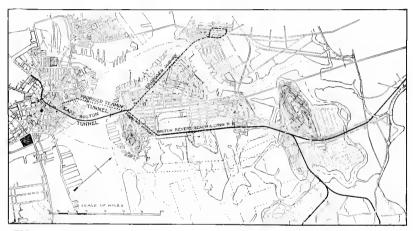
PLAN FOR A TEAMING TUNNEL AND FOR SUBWAY EXTENSIONS.
